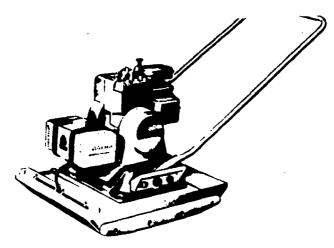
Self-propelled, hand guided vibrating plate compactor.
